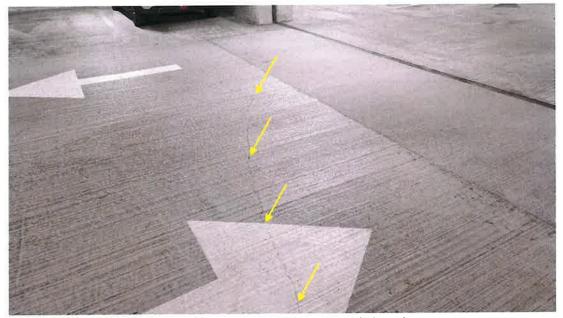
Cracking at Repaired Expansion Joint Following Banded Tendons
